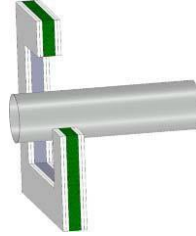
Gypsum wall construction - mineral wool boards with fire resistant coating
